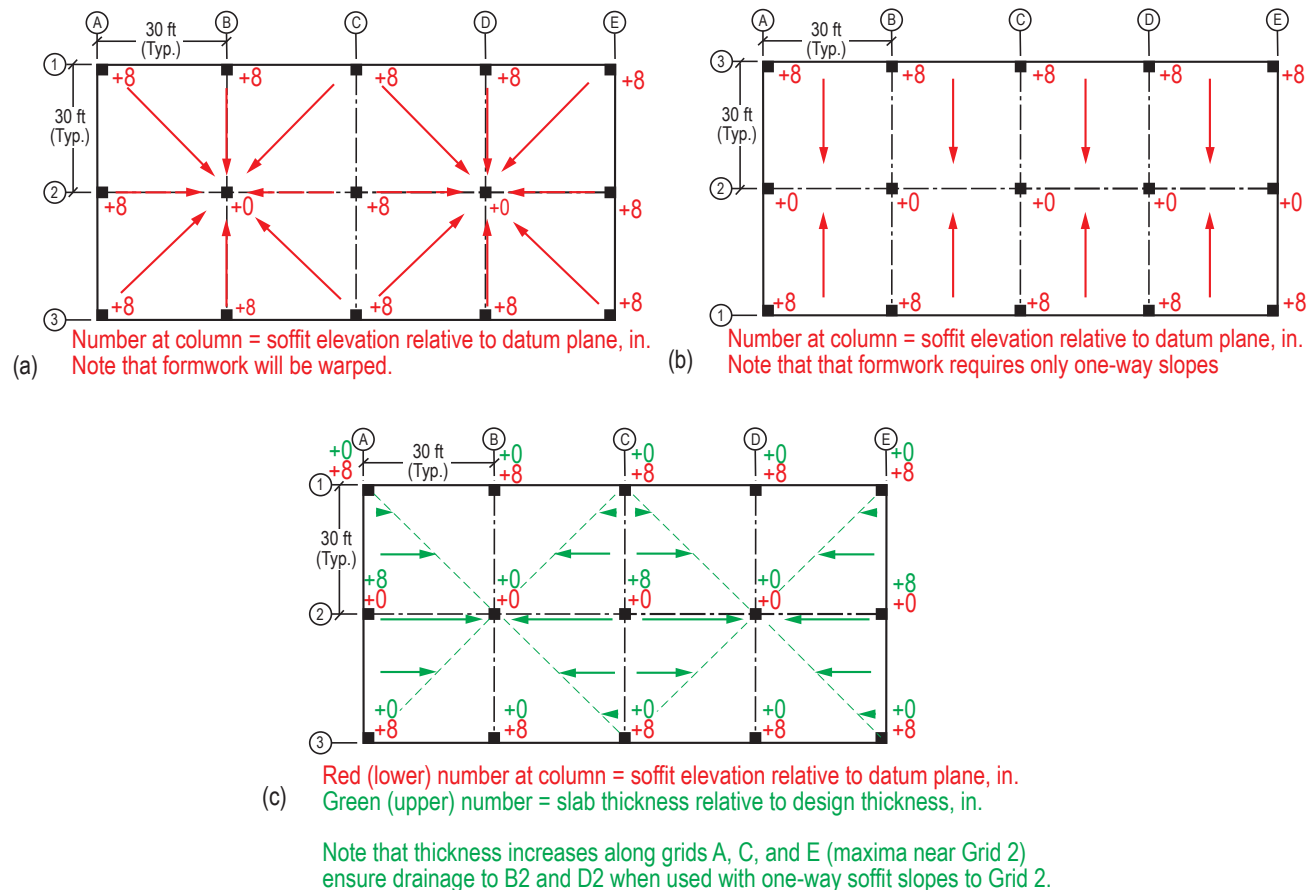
Schematic illustrations of an eight-bay roof plan with two interior drain points: (a) two-way sloping of the soffit creates constructability challenges because it requires warping of formwork; (b) one-way sloping of the soffit allows the formwork elements to remain straight; and (c) localized increases in slab thickness (or crickets formed using a topping course or added insulation) can be combined with one-way sloping of the soffit to enable two-way slopes.
